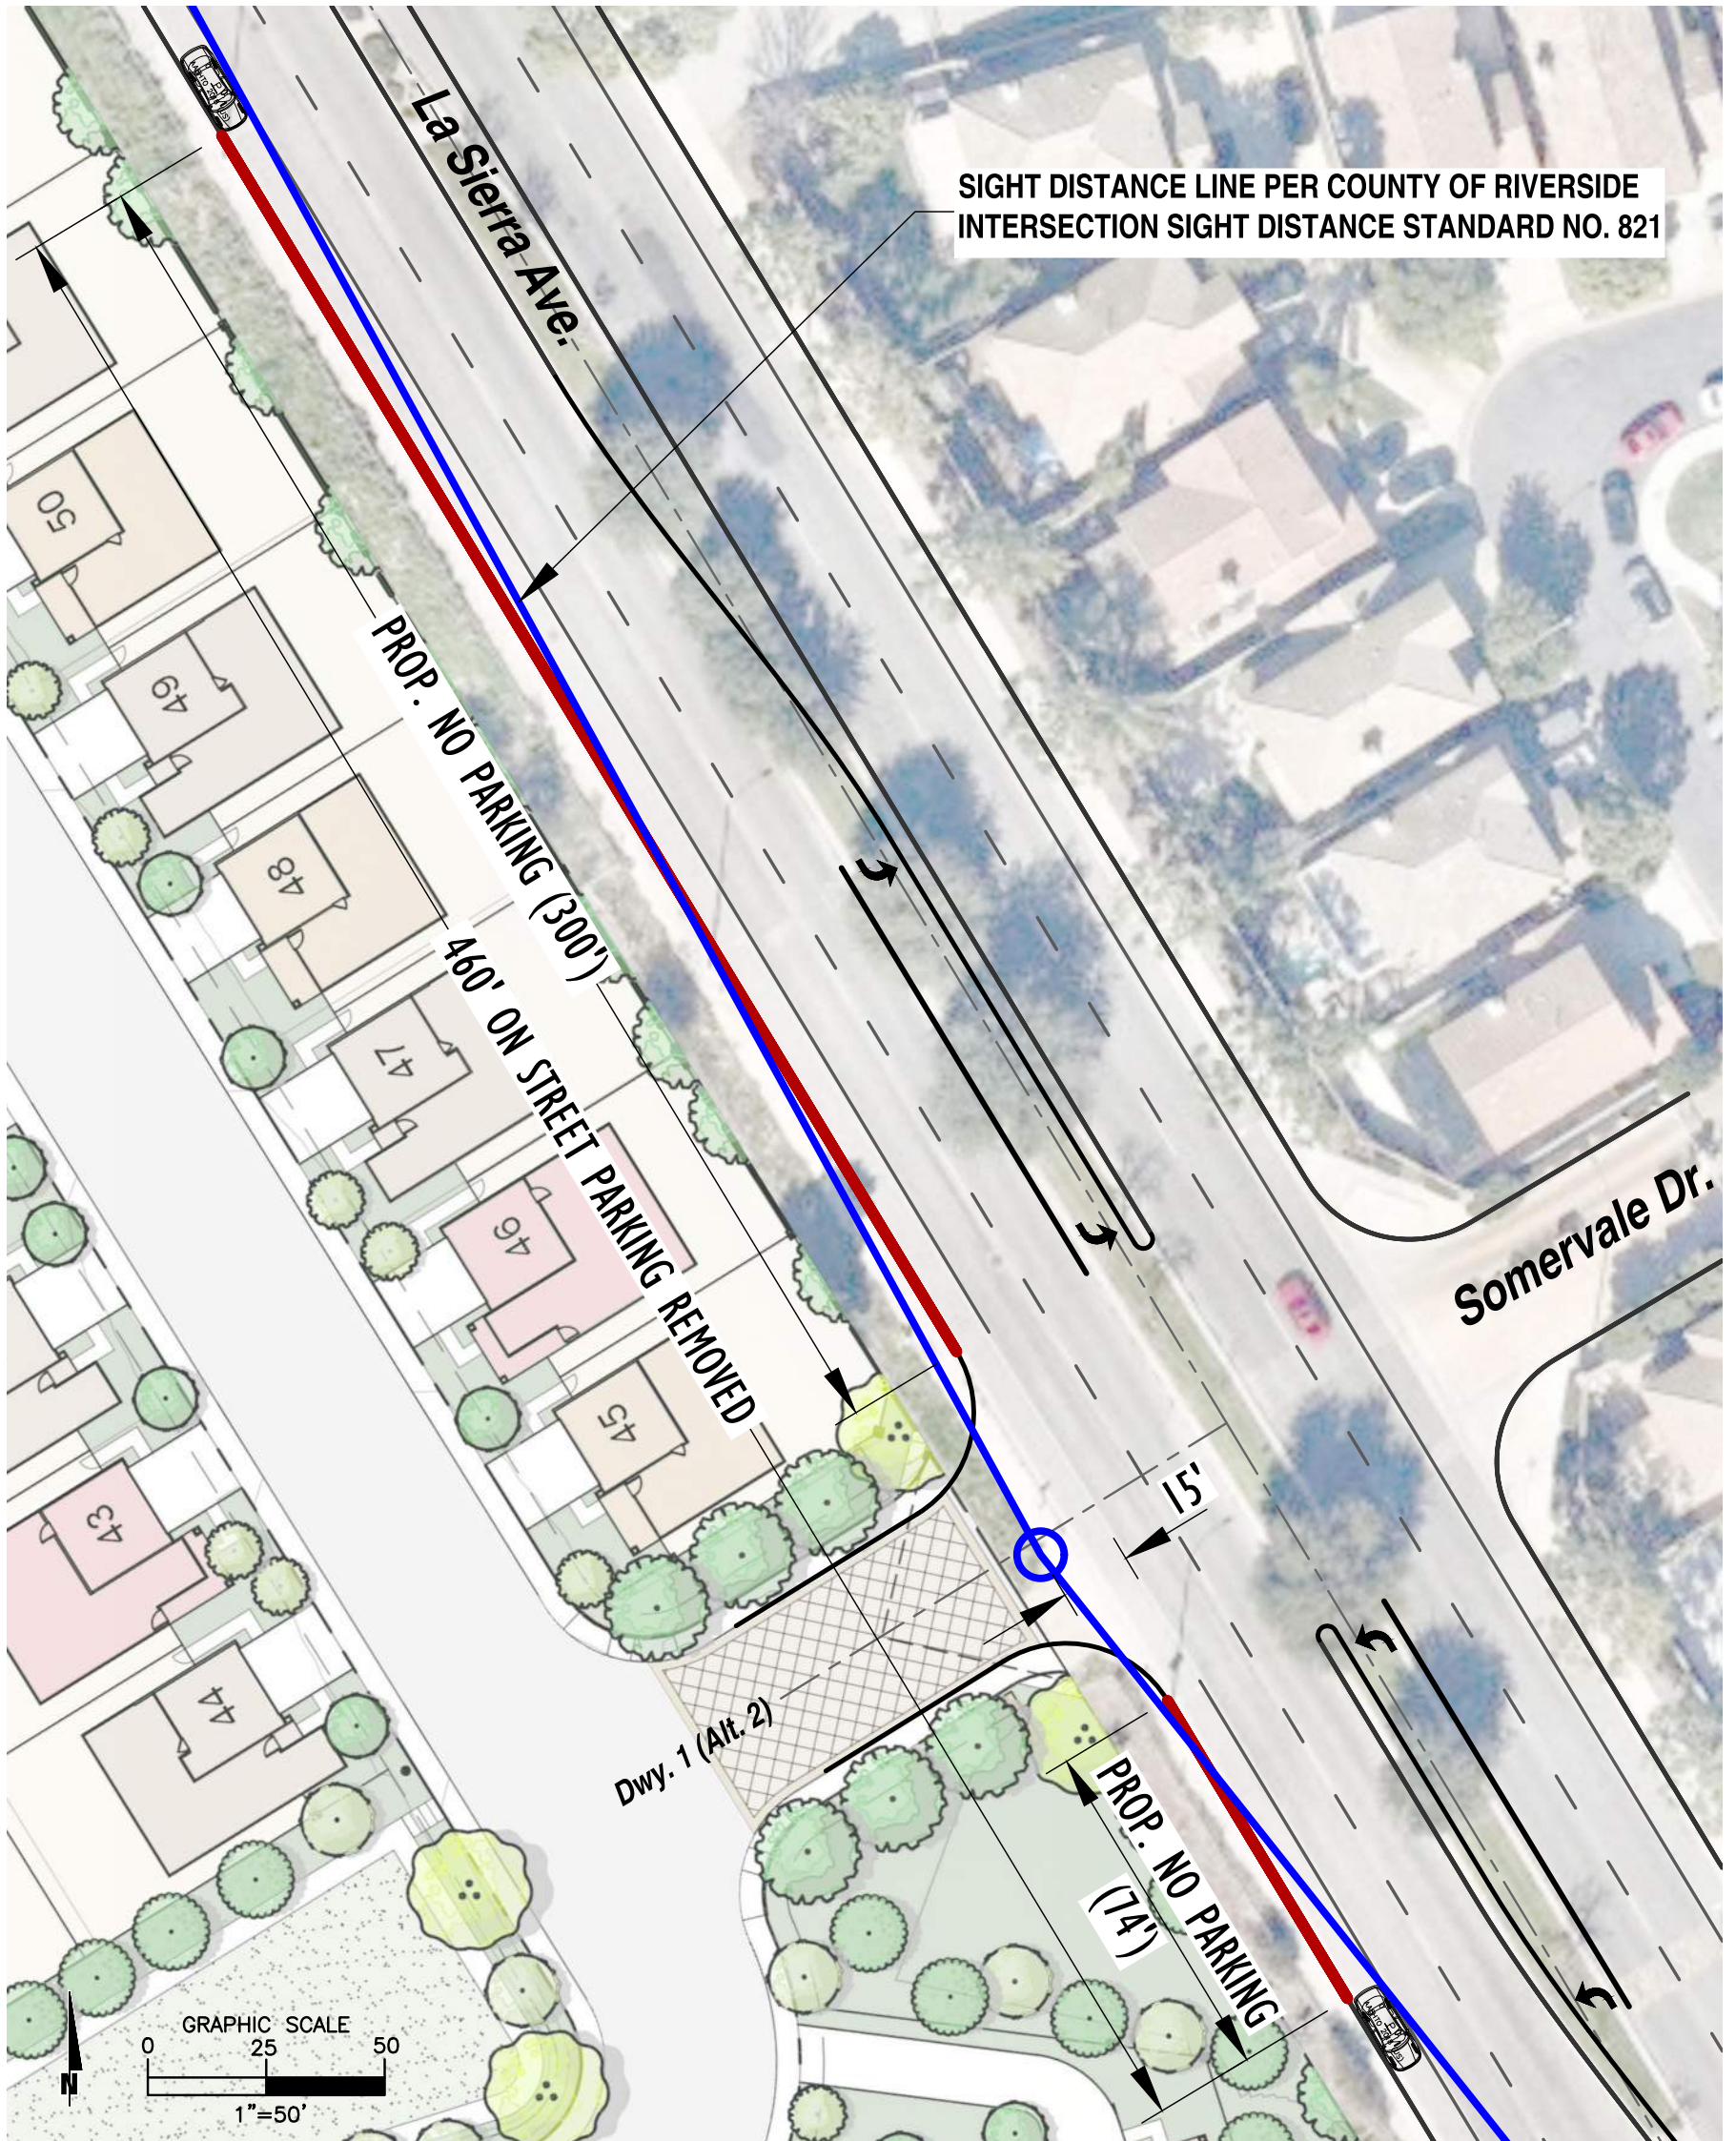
CONCEPTUAL PLAN (ALTERNATIVE 2)
